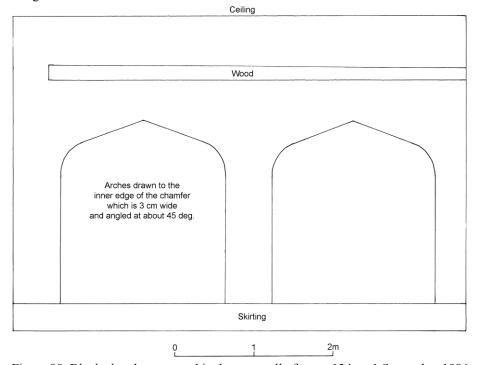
Blocked arches exposed in the east wall of room 134 on 1 September 1986.
